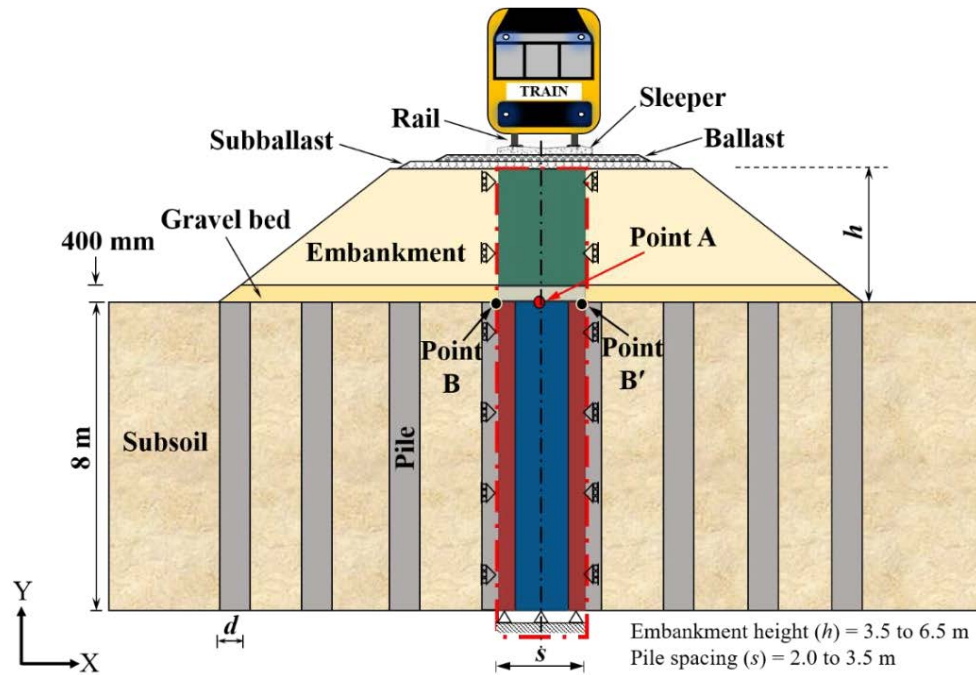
Typical pile-supported railway embankment with modelled unit cell
